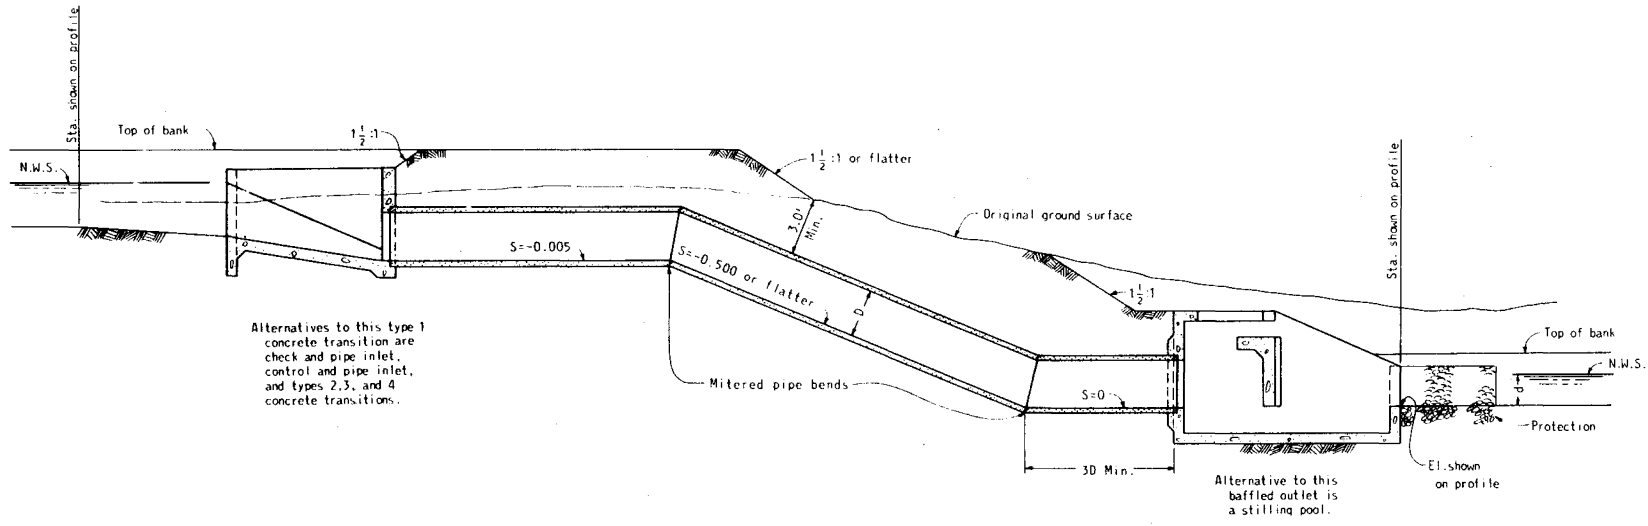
Type 1 pipe drop—plan and sections. 103-D-1271.
